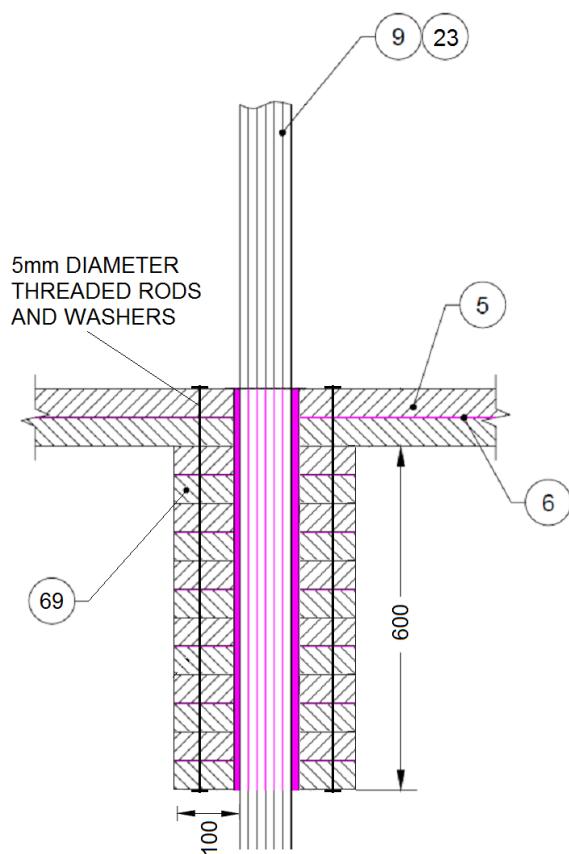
Section View of D1 and D2 Cables with/without Cable Trays in TBA Firefly™ Intubatt not against Wall Construction in Horizontal Substrates - Wrapping top side
